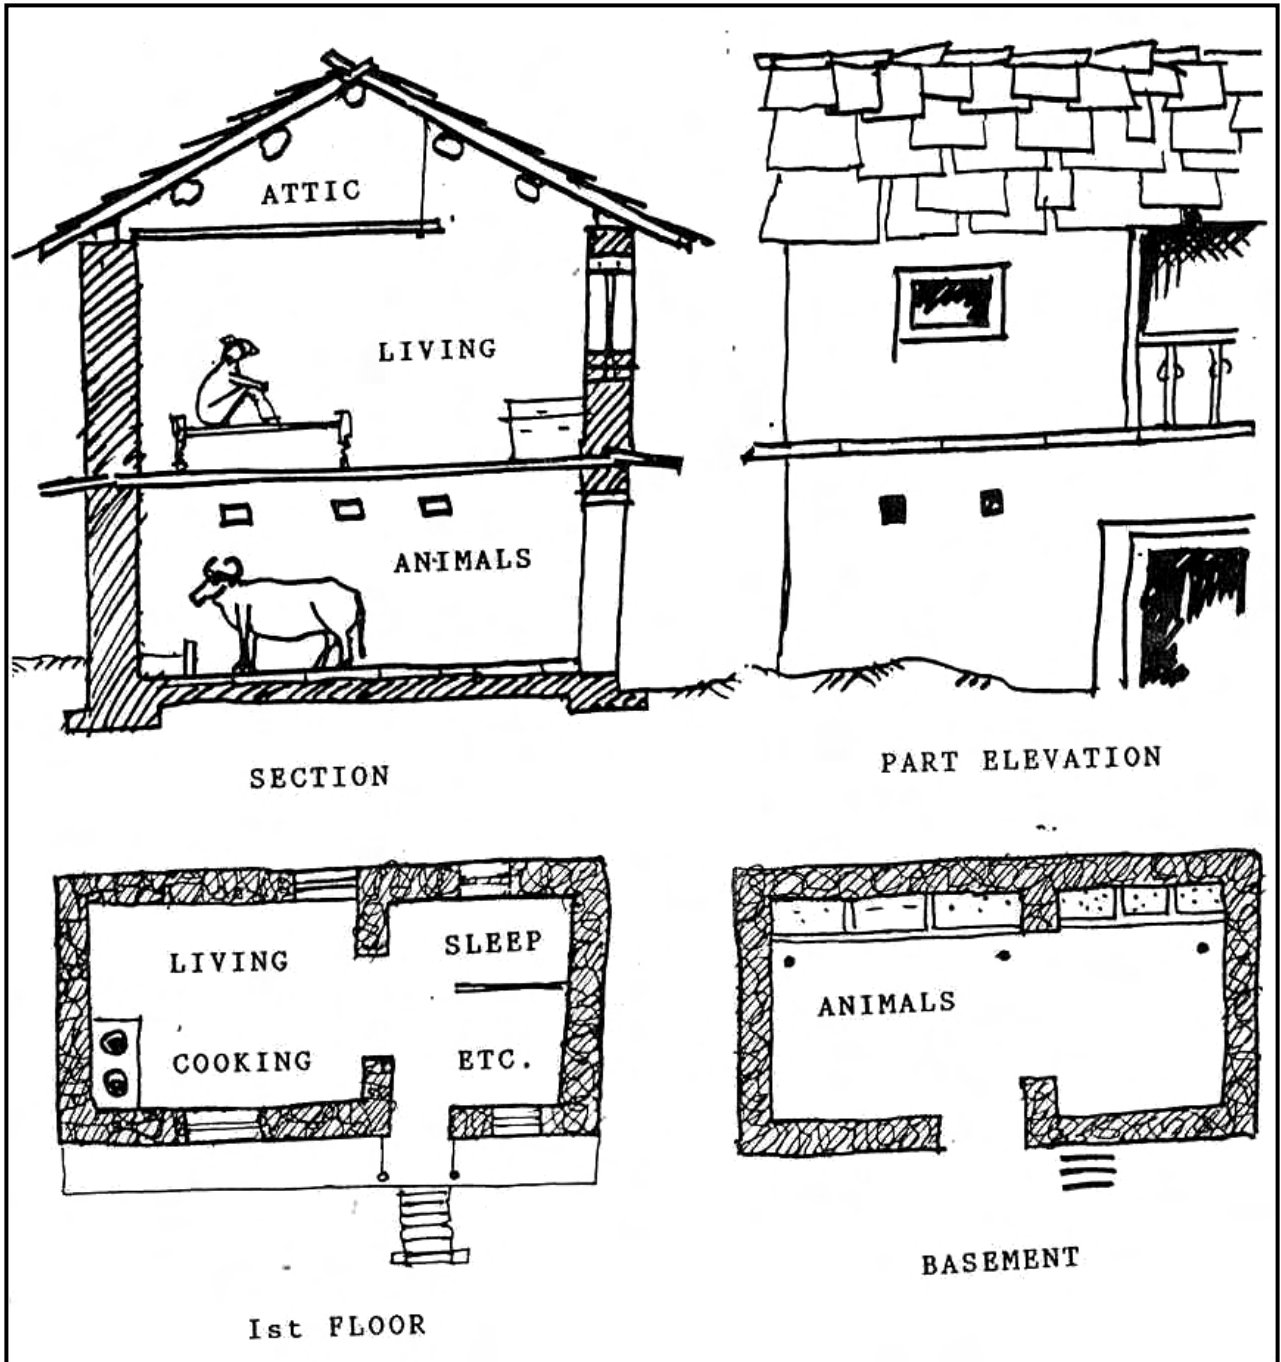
TYPICAL HOUSING PLAN IN THE HILLS
